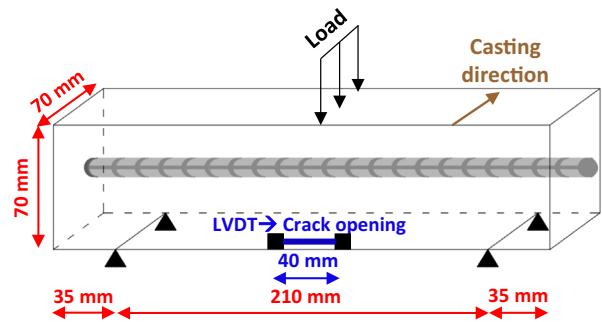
Three-point bending test on 70 × 70 × 280 mm specimen.
